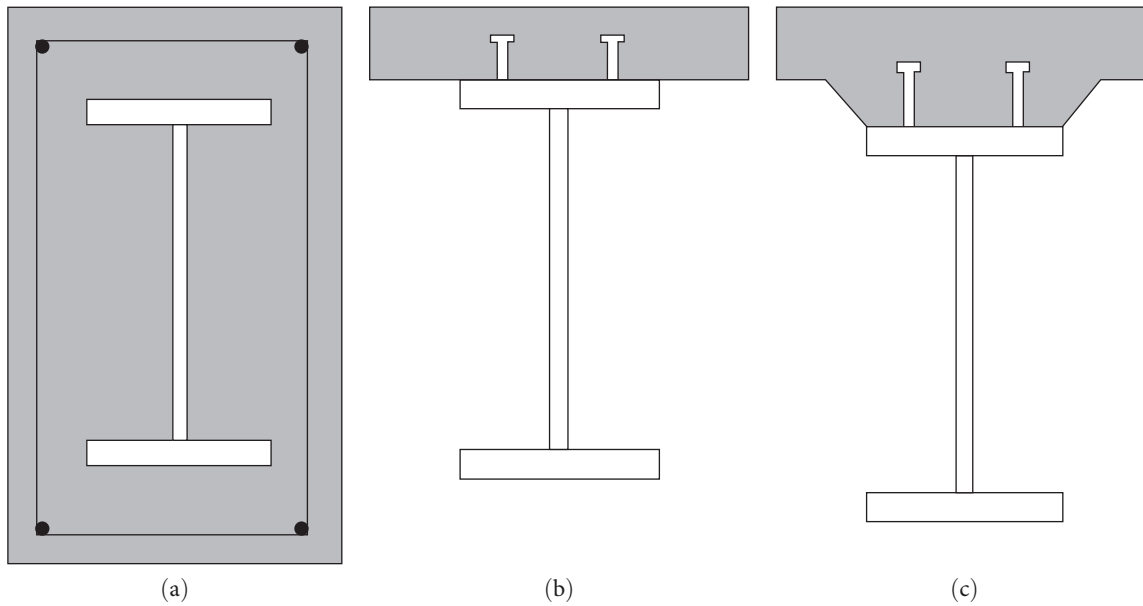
Different cross-sectional forms of composite beams. (a) Concrete encased steel composite beams. (b) T-shaped composite beam without flange plate. (c) T-shaped composite beam with flange plate.
